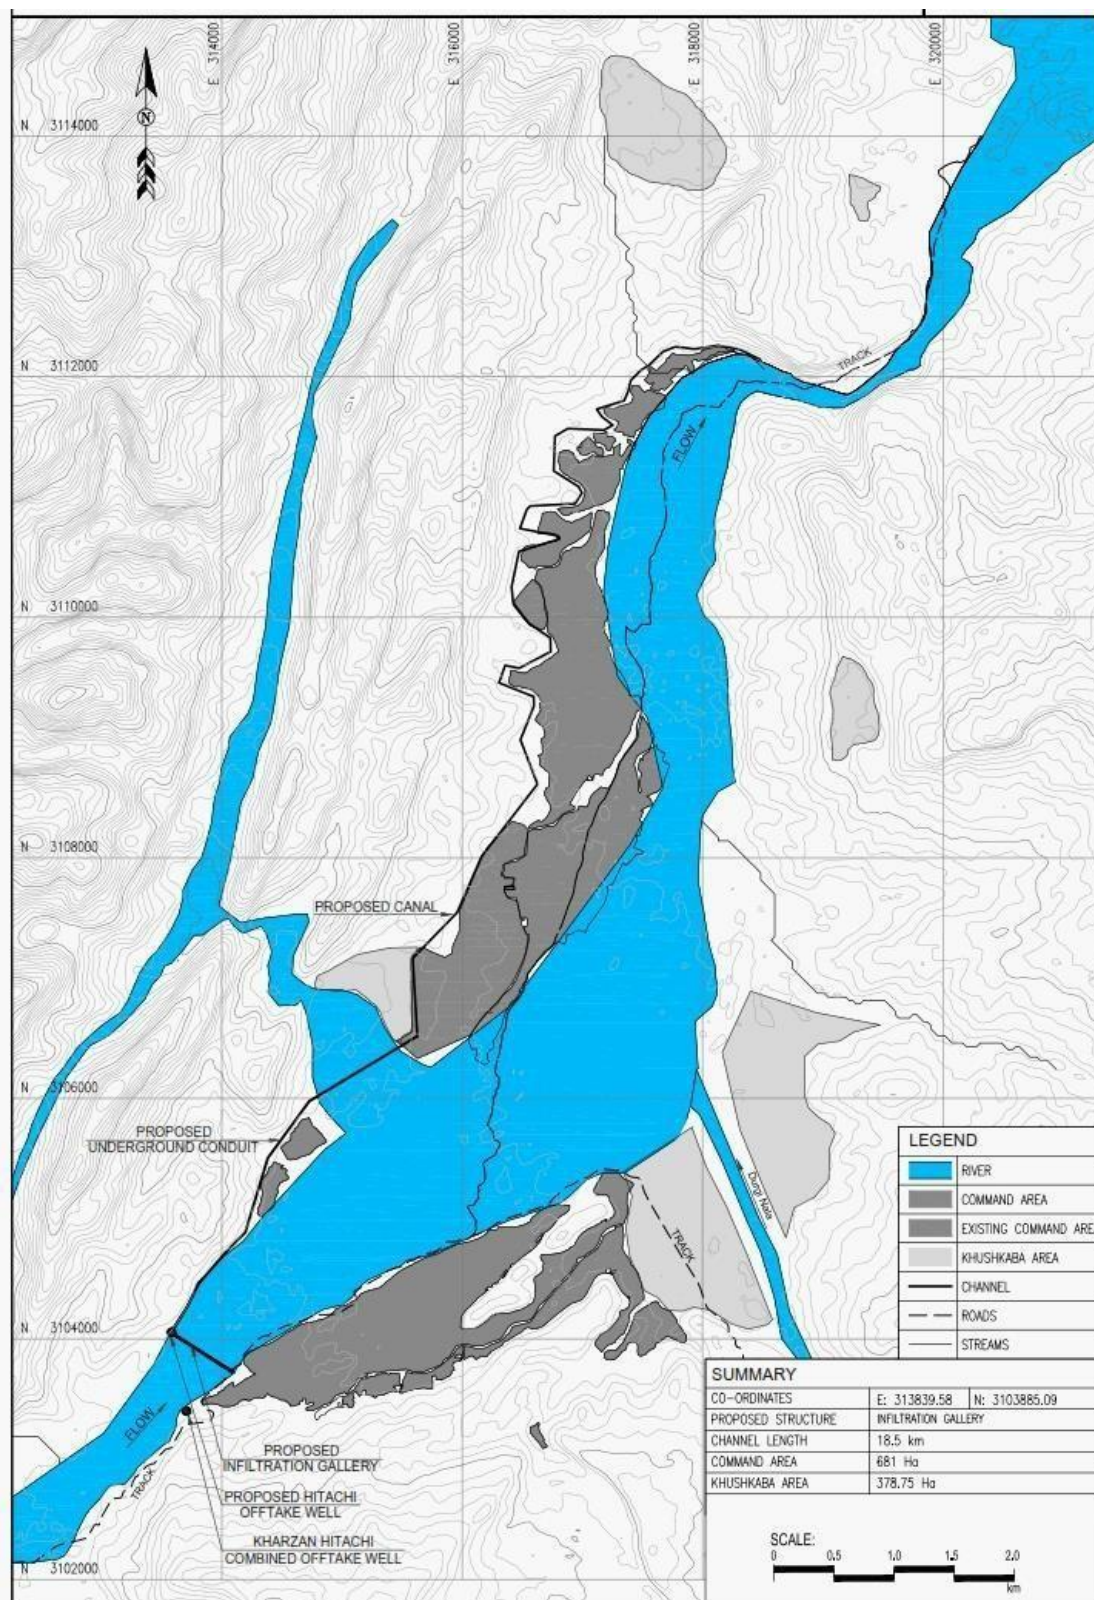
Kharzan Hatachi infiltration gallery sub-project – layout plan
